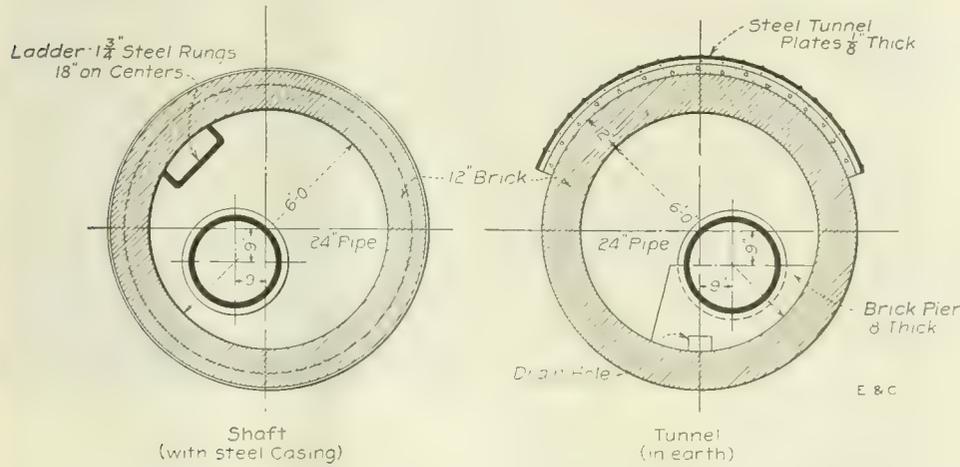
Typical Sections of Shaft and Tunnel at Charlestown Shaft, Constructed in 1912.
